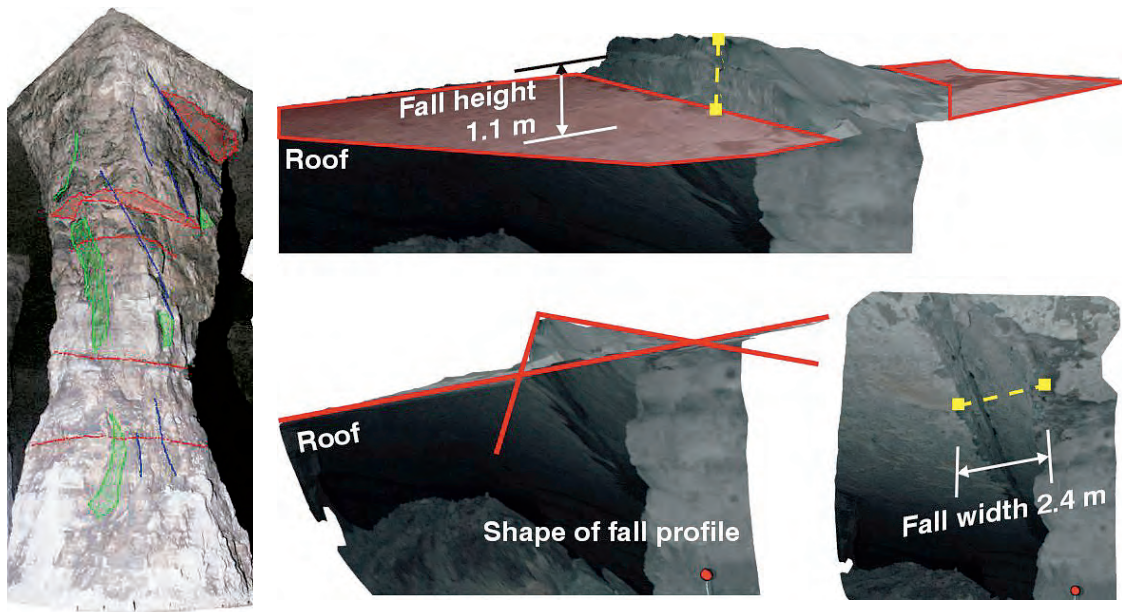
Documentation of pillar conditions. Cross section, curvature, breakouts (left). Remote survey and characterisation of roof falls in unsupported rock faces. Fall height, width, shape (right)
